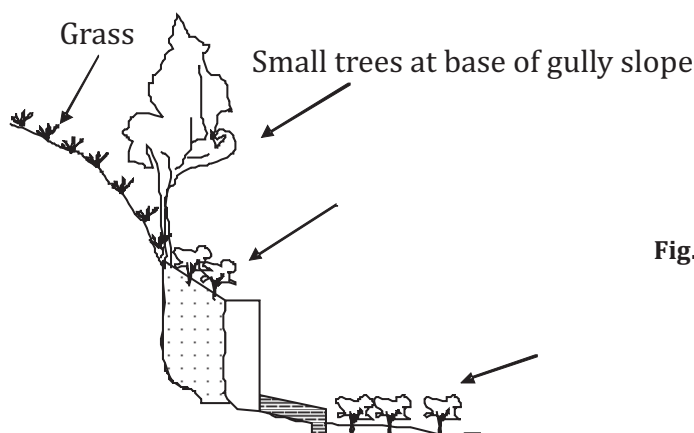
Sketch design for bioengineering scheme to stabilise gully head
